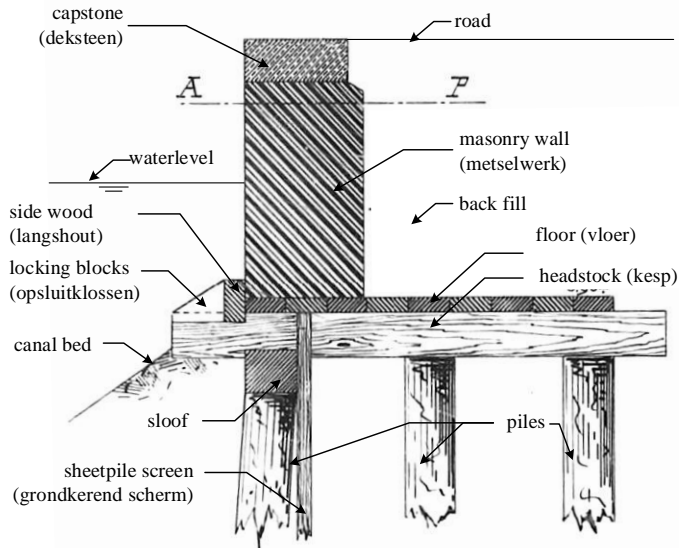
, Cross-section of historical quay wall structure with terminology. (Lijnbaansgracht, tussen Palmgracht en perceelno. 14, Archive of Amsterdam)
